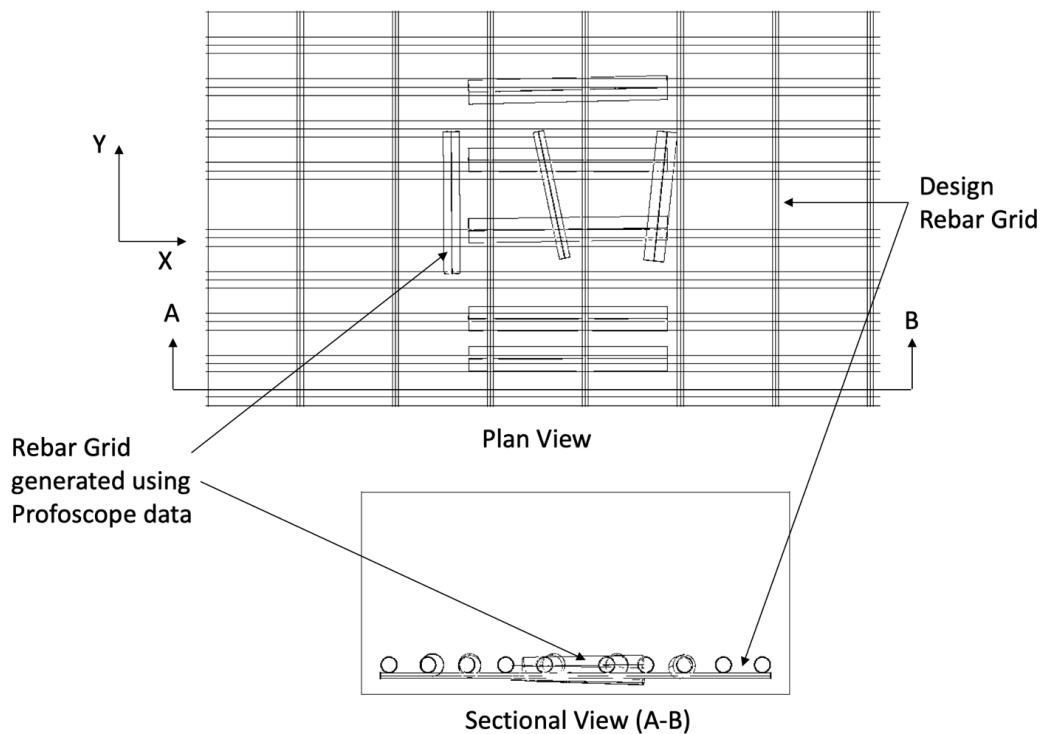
Rebar Grid generated using Profoscope data (RC Bridge Deck Slab at Site SI-3006A)
